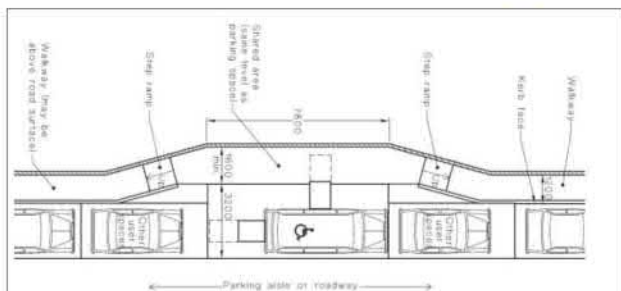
Extract from AS2890.6 outlining accessible requirements for parallel parking.
